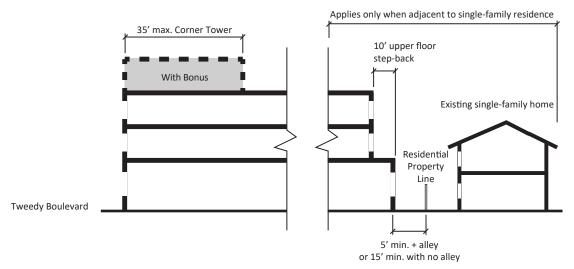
Maximum Building Envelope Sites Less than 200' Deep
